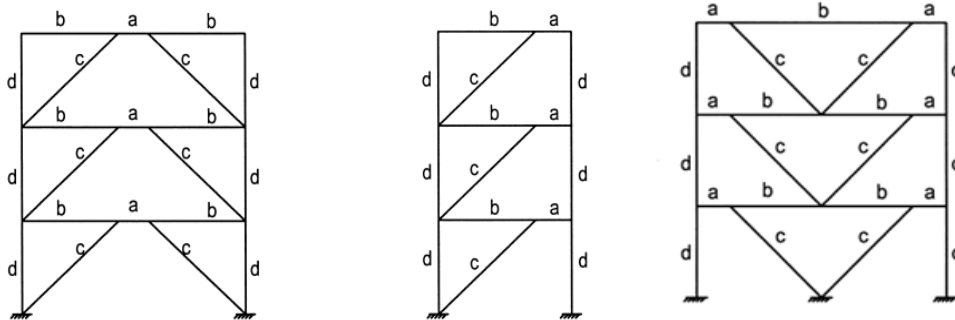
Examples of eccentrically braced frames. a :link , b: beam segment outside of link, c:brace, d: column.
